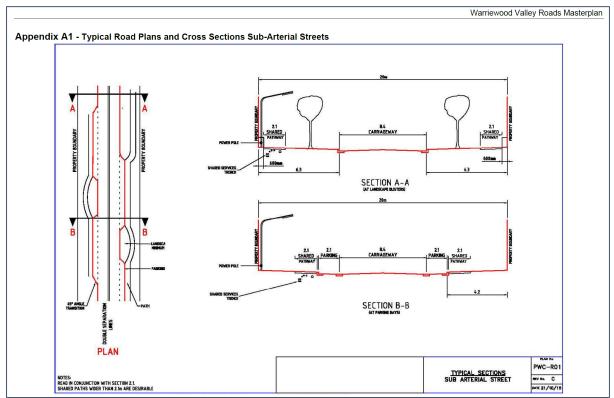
Typical road plan and cross section of sub-arterial roads (Source: Warriewood Valley Roads Masterplan)
